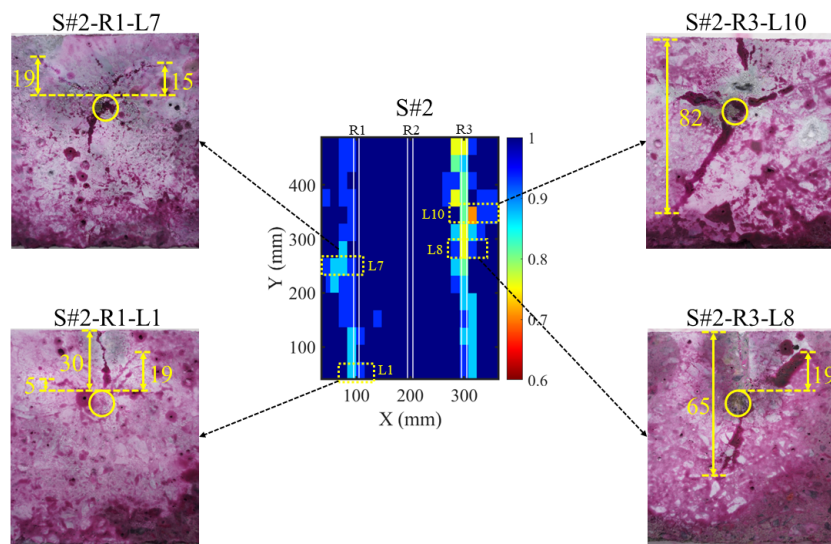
Dye penetrant crack patterns on different cross-sections of specimen S#2.
